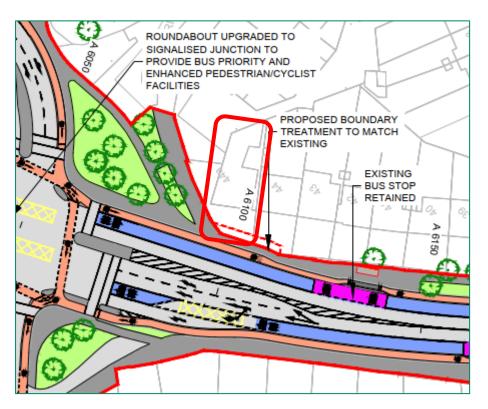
Proposed new Layout at The Mornington Centre
